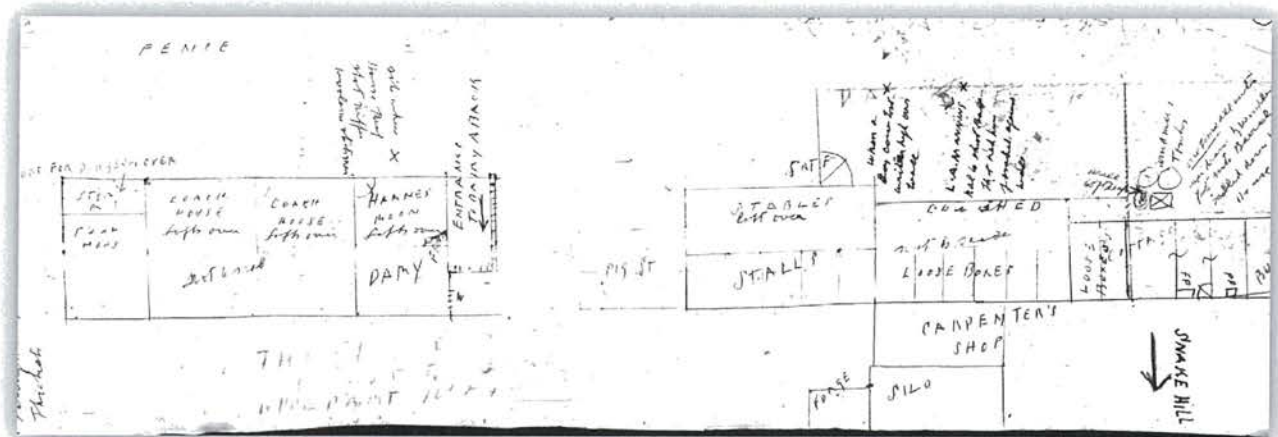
Detail of L.C. Manning's Plan showing farm buildings. Battye Library
